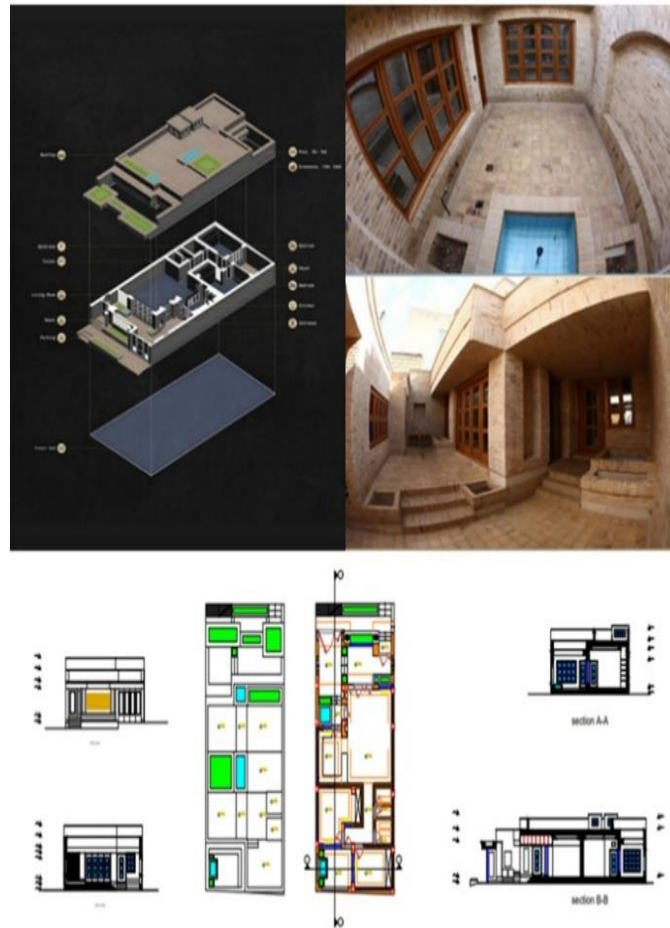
A view of a concrete building design with ETABS software and a 3D architectural model
